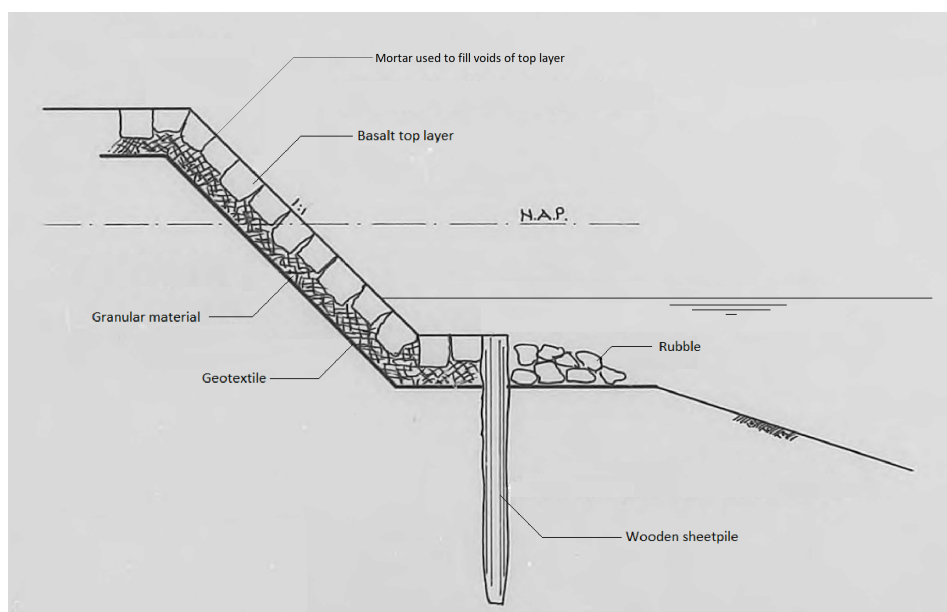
Typical cross-section of a quay wall design consisting of a sheetpile with sloping gravity wall (Stadsarchief Amsterdam, 1968).
